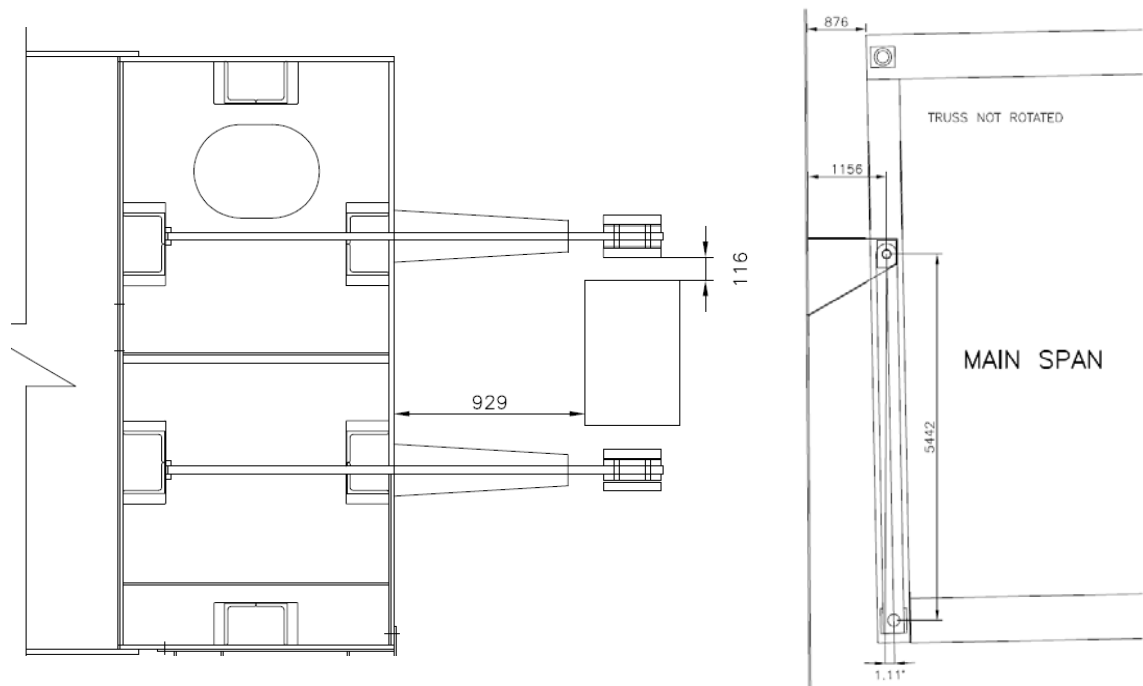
Starting Position of Stiffening Truss Relative to Towers
